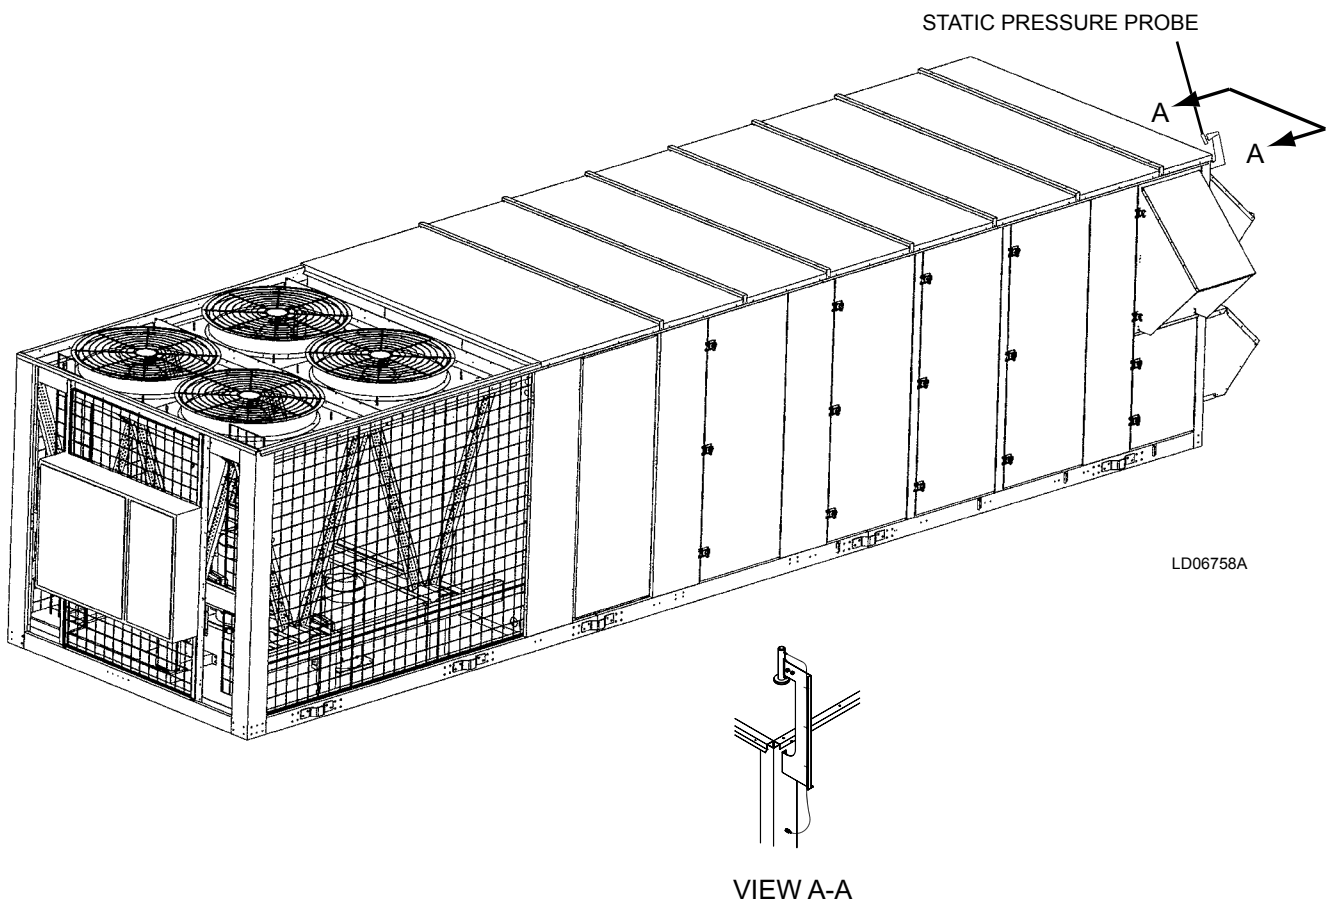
STATIC PRESSURE PROBE LOCATION
